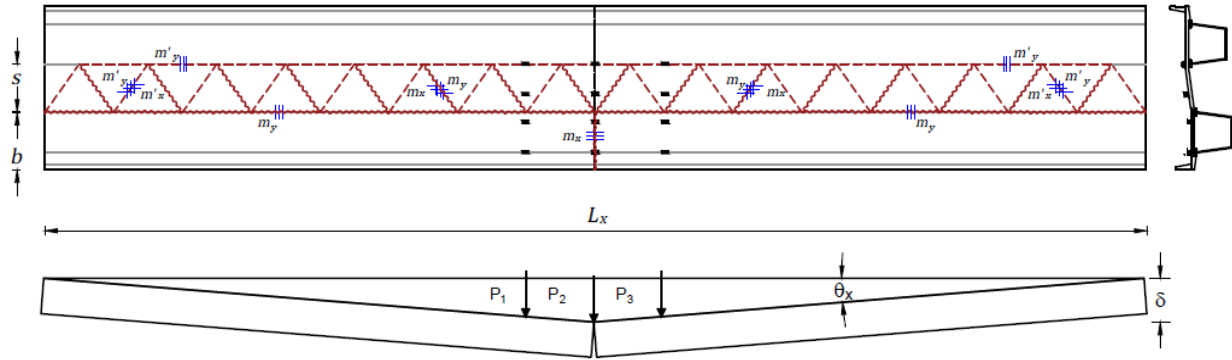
Plan, cross-section, and side elevation with HL-93 loading for single-span bridges.
